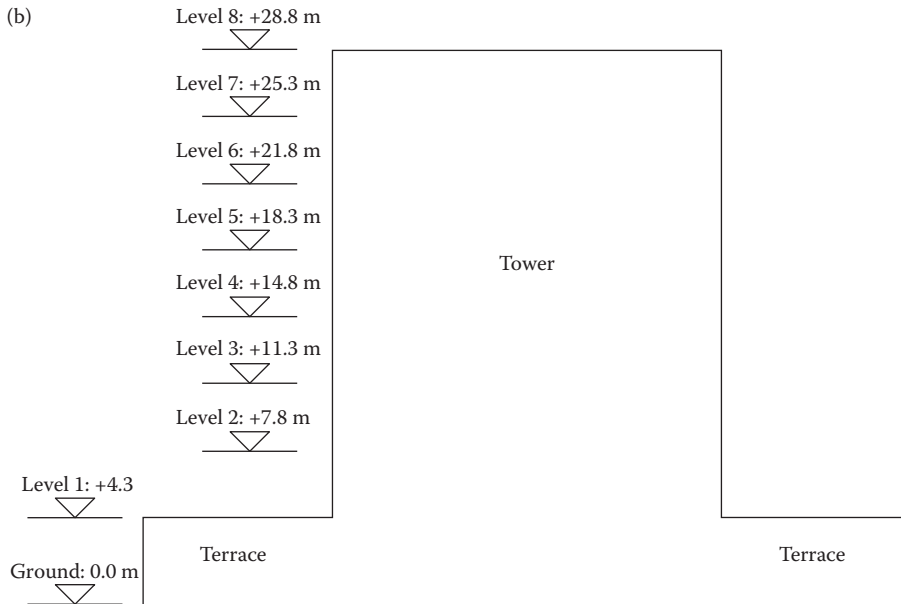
(Continued) Structural layout taken for regularity checks. (a) Plan and (b) Elevation.
